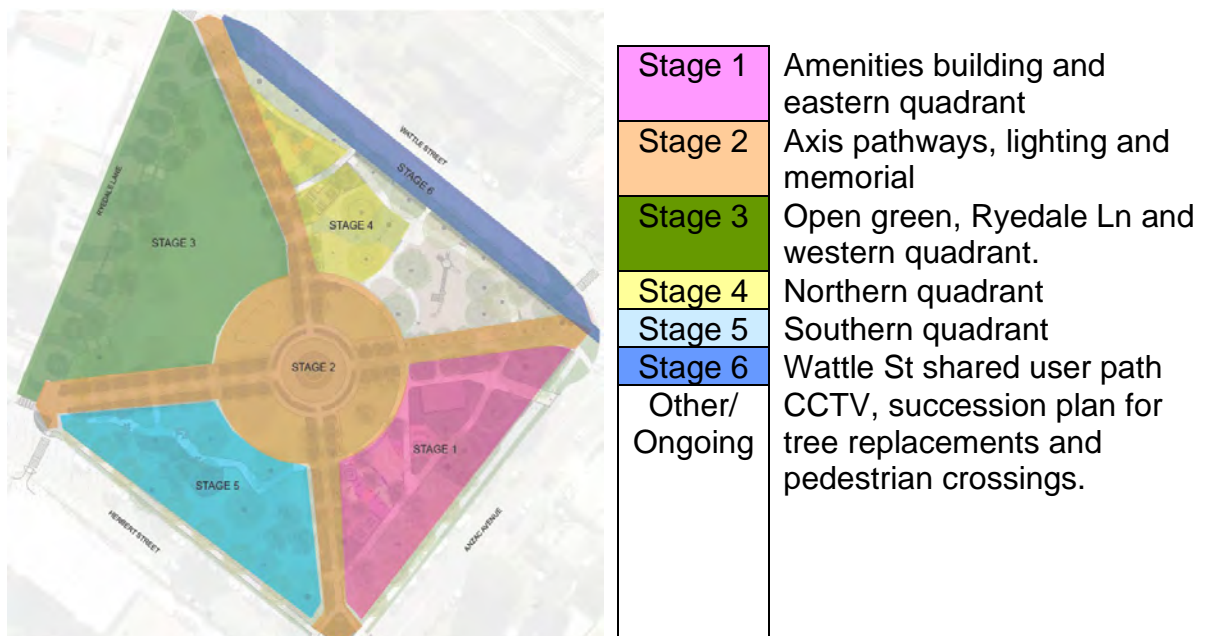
Masterplan Staging Plan as provided in ATTACHMENT 1.
